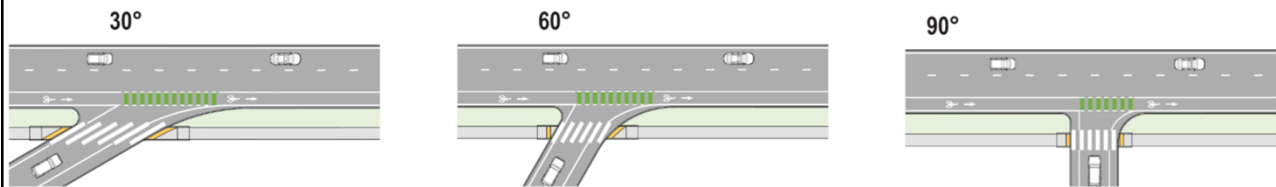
Examples of 30-, 60-, and 90-Degree Roadway Intersections
